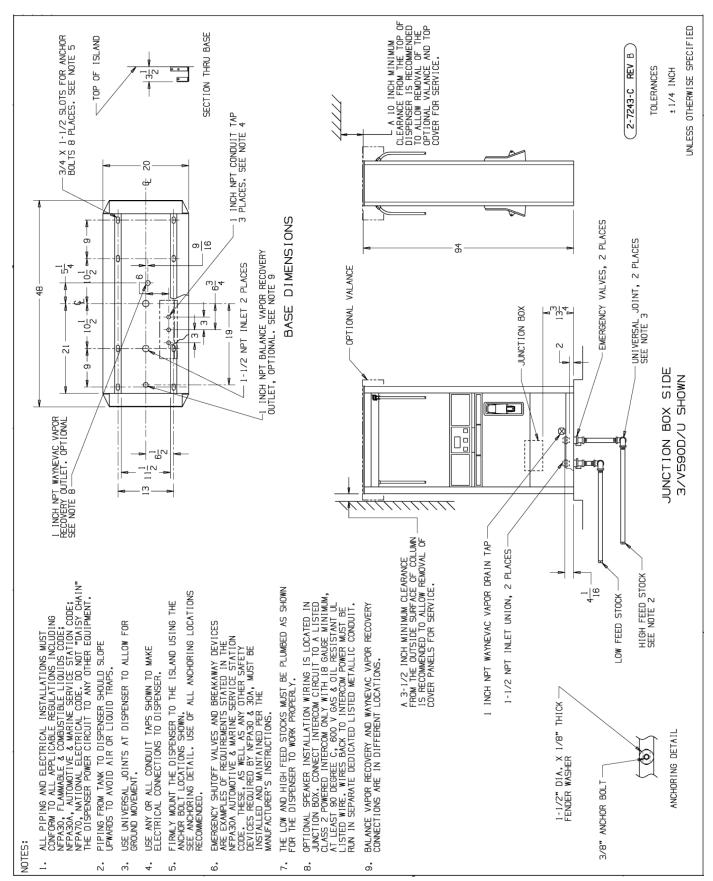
2-7243-C Installation Instructions - 4/V590D/U and 4/V595D/U(Remote)
